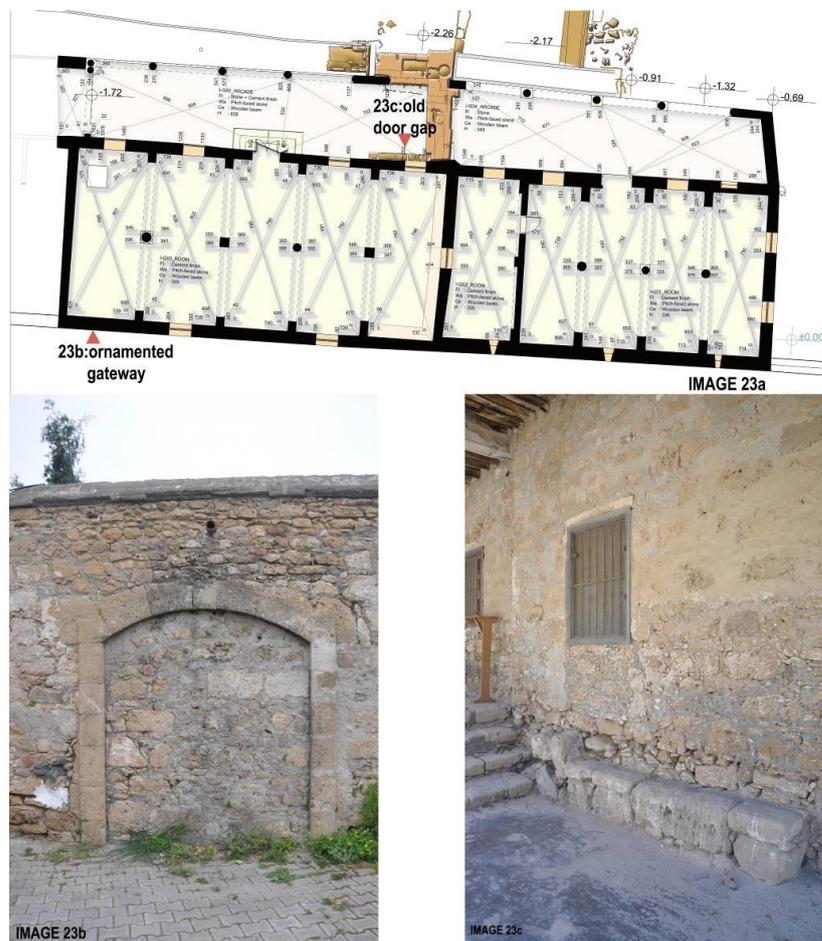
(a) Survey drawing of the south wing building, ground floor plan (b) Image of the ornamented gateway from south elevation (c) Image of the wall from arcade
